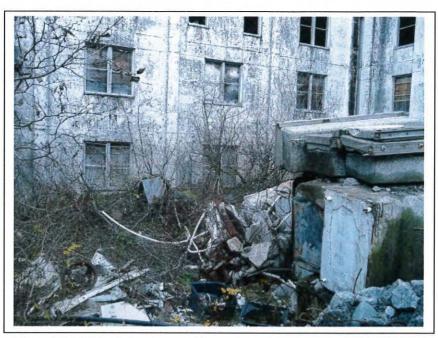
Debris observed between Sections B and C; looking north. (October 22, 2014)
